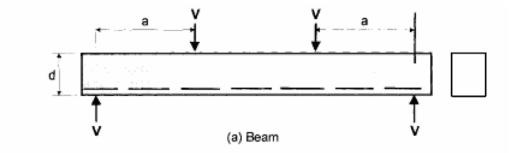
Typical experimental set up for shear strength of RC beams without stirrups.
